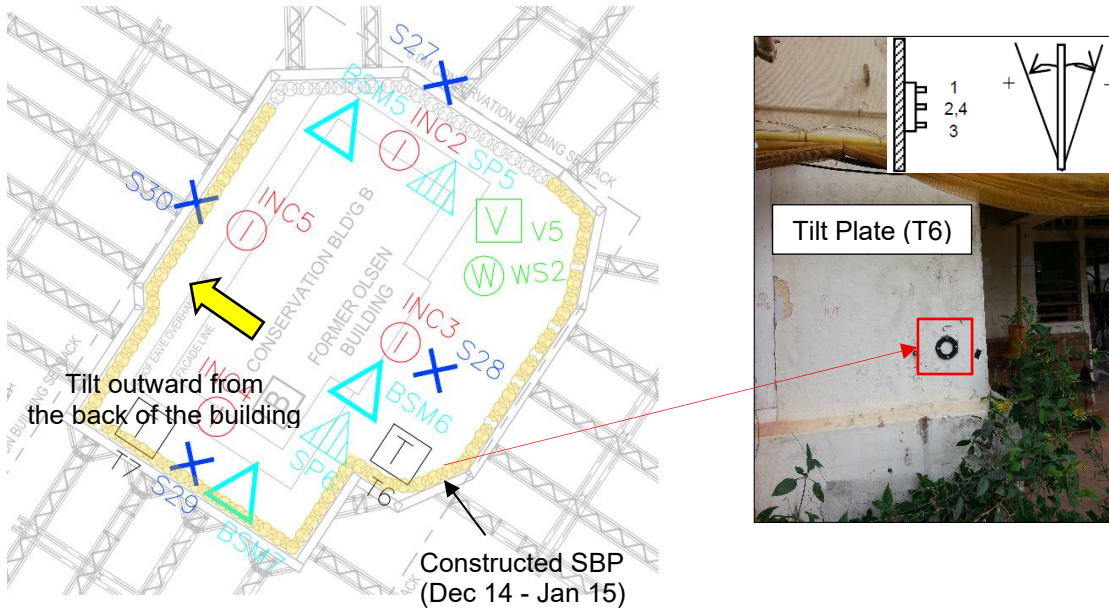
Instrumentation plan (left). Tilt plate (T6) installed on the former Olson Building (right)
